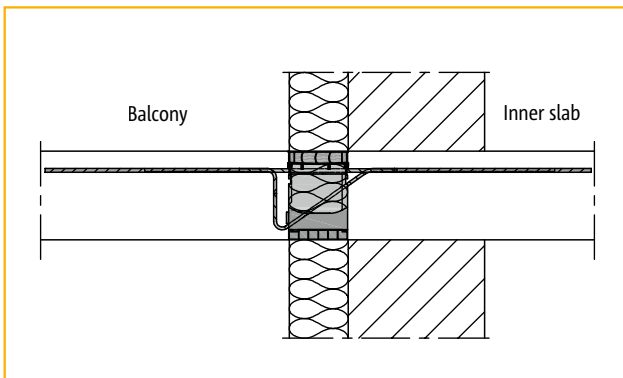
Brickwork with external insulation and a balcony at inner slab level
